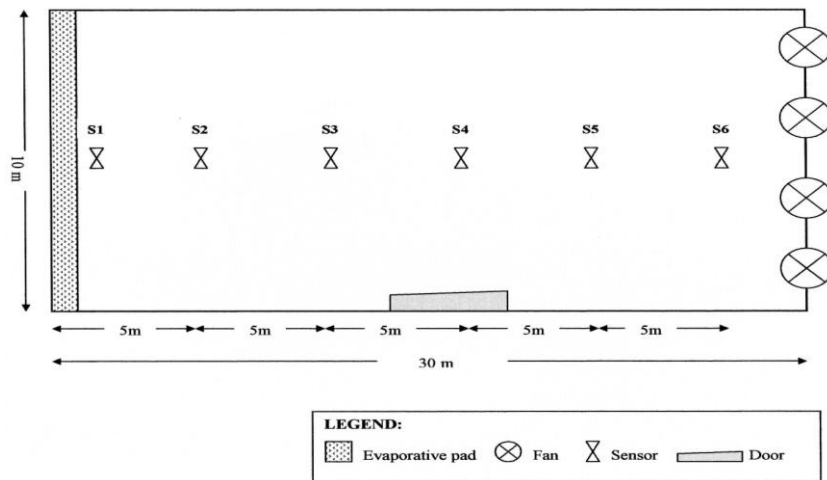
Greenhouse floor plan of the sensors in a horizontal plane
